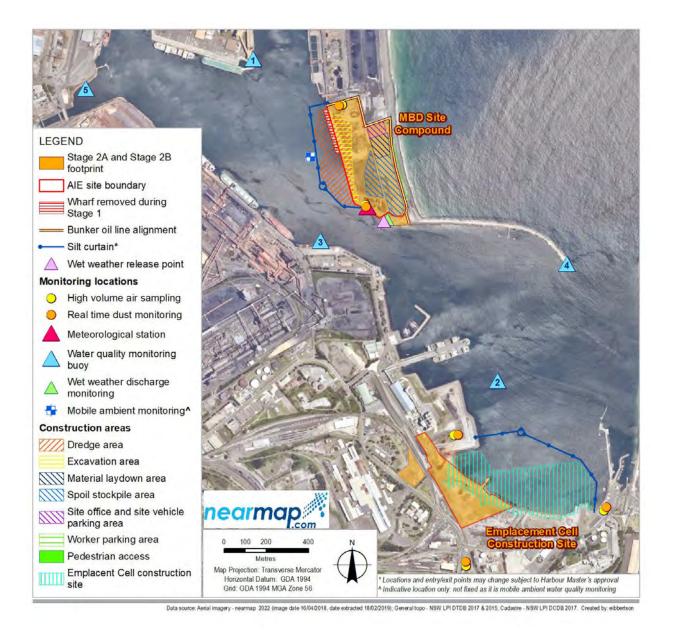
Stage 2A and Stage 2B works and location of MBD Site Compound, Emplacement Cell and Emplacement Cell Construction Site
